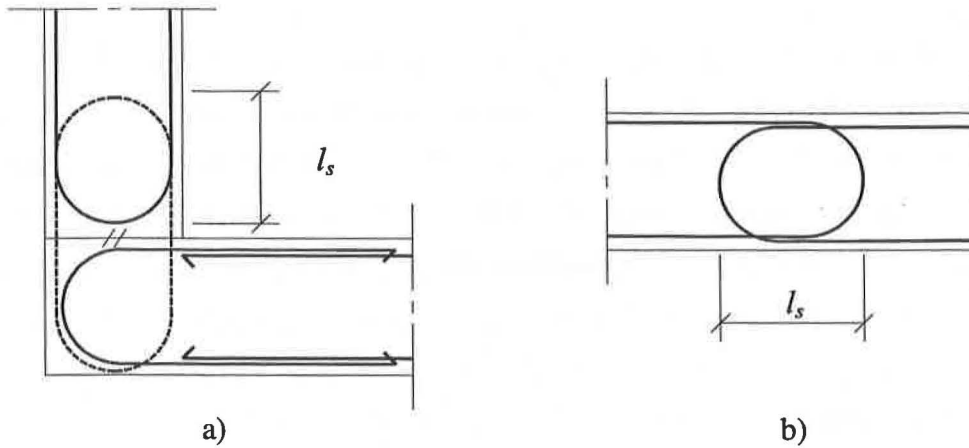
Splicing of reinforcement outside the corner area using reinforcement loops.
